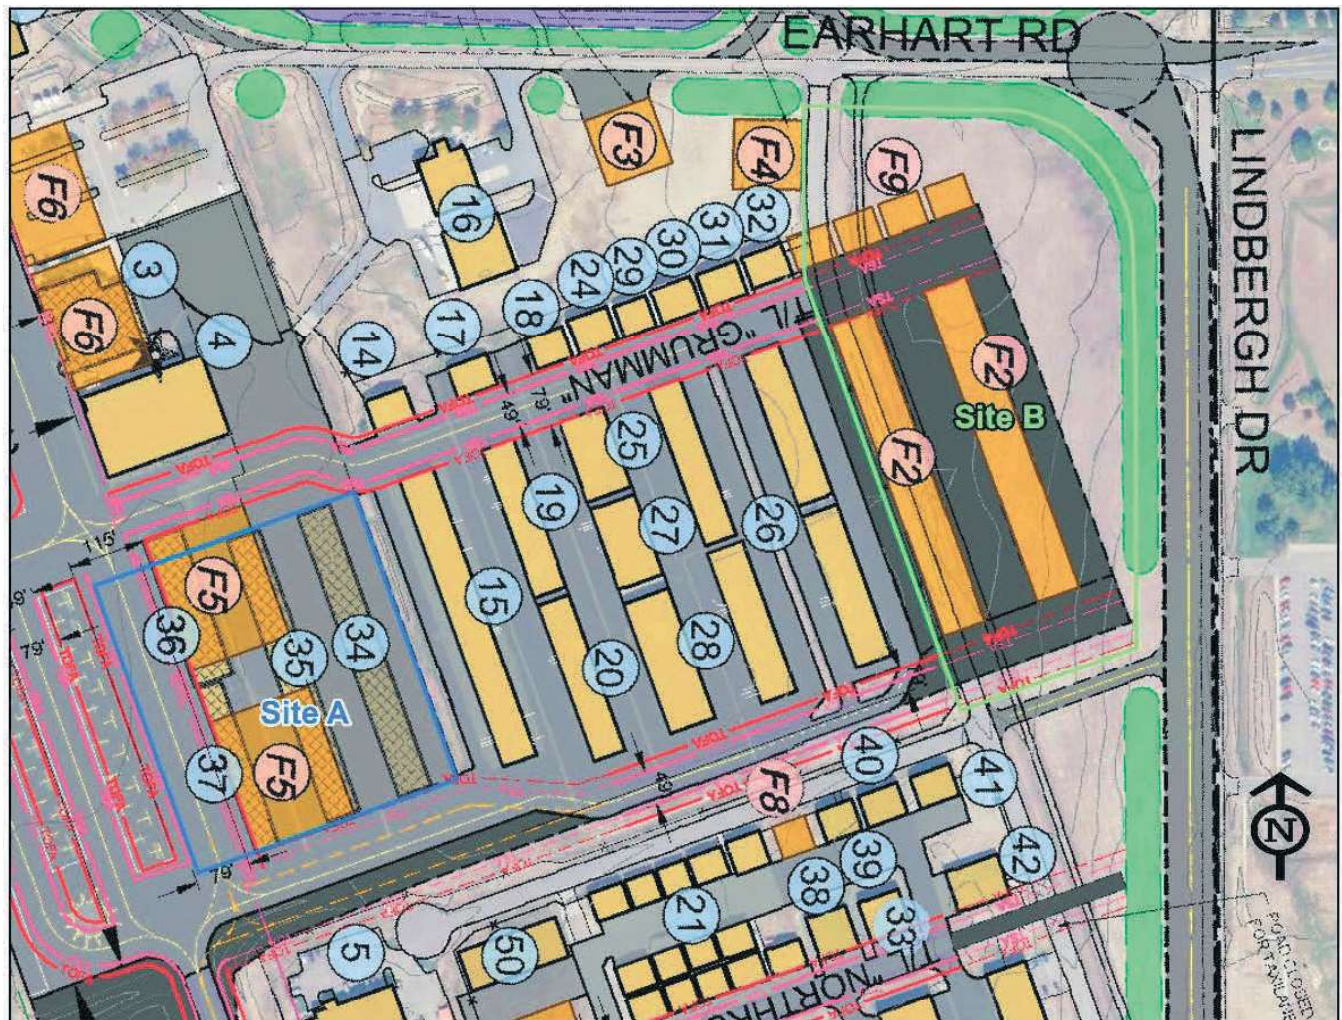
Site A&B Airport Layout Plan from 2020 Northern Colorado Regional Airport Master Plan
